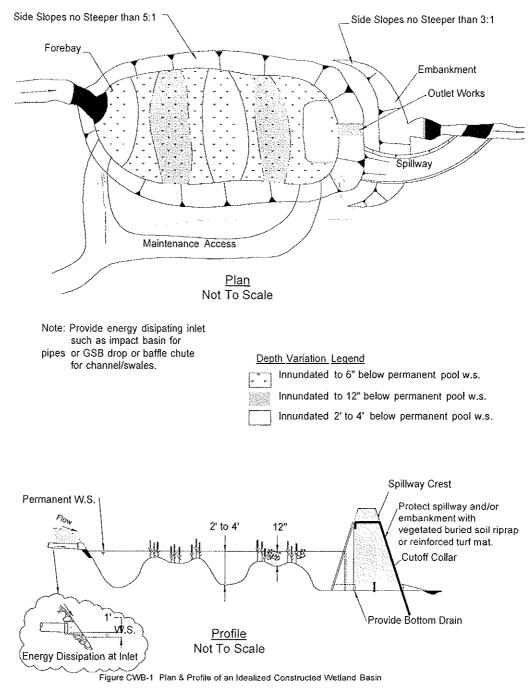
Constructed Wetland Basin - Plan and Cross-Section
